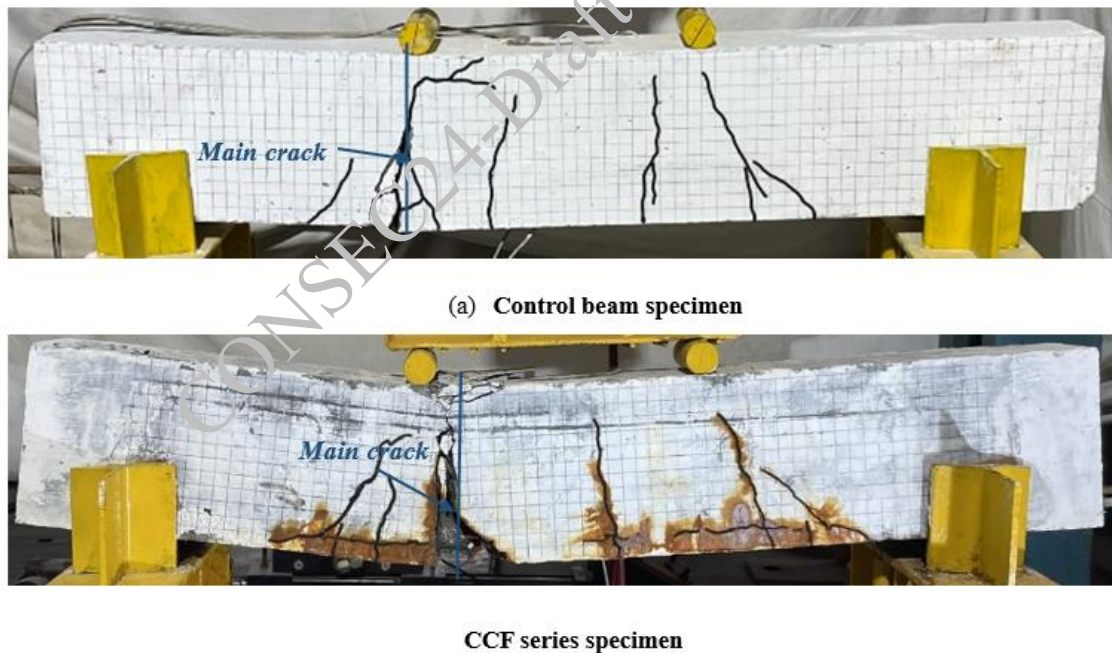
Crack patterns at fatigue failure of specimens
